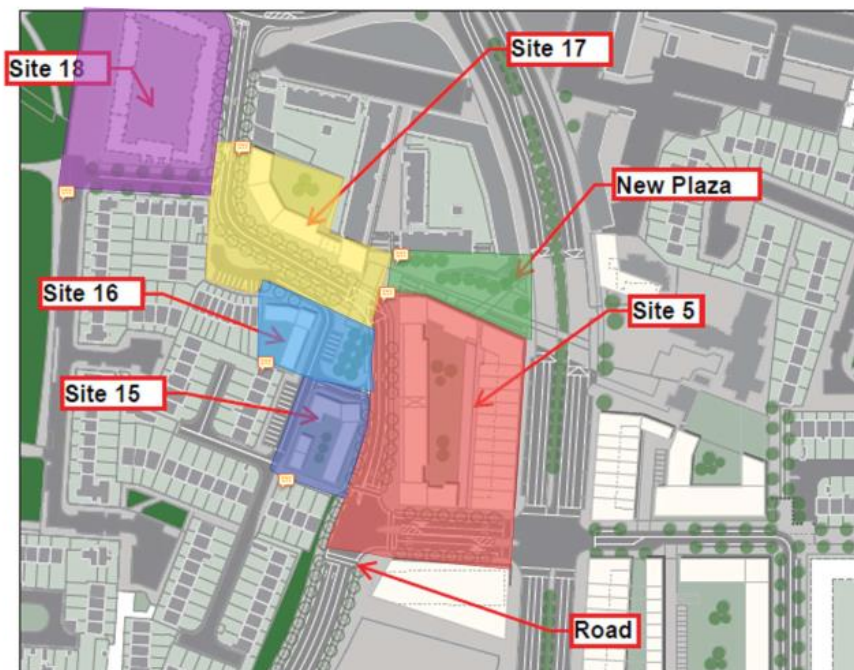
Site Plan outlining Sites 5, 15&16, 17, 18
